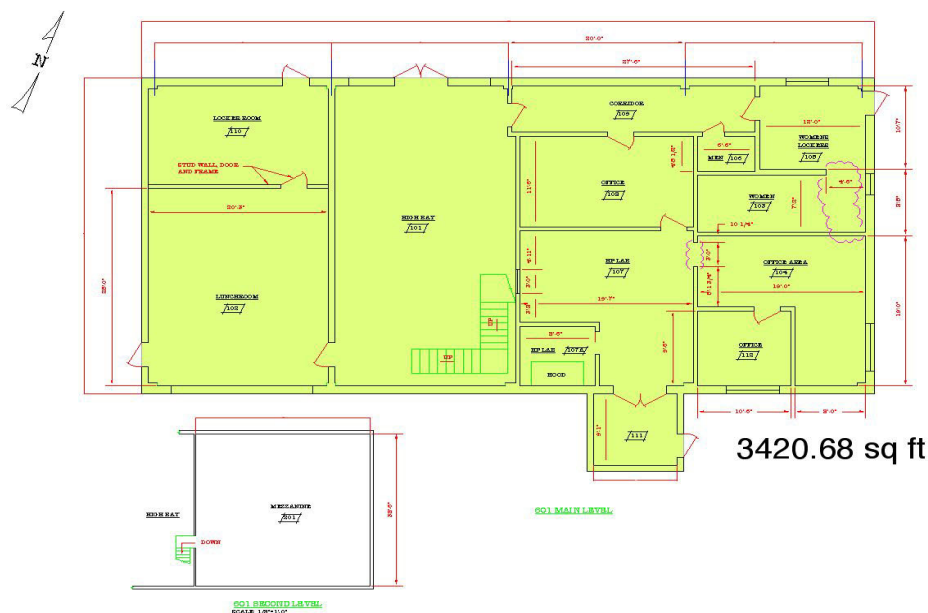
Radioactive Waste Management Complex WMF-601 floor plan.
